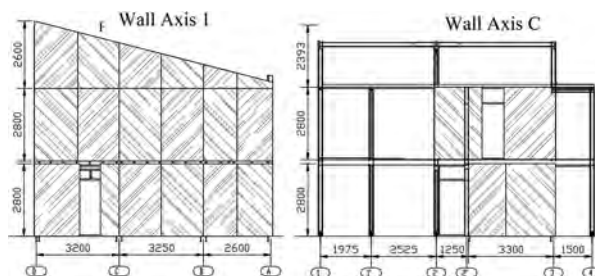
Examples of shear walls on transversal and longitudinal directions (Ungureanu et al. 2011b).
